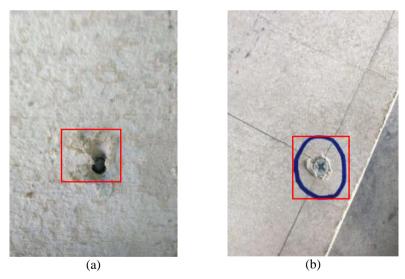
Dry board failure: (a) crushed on dry board; (b) circular crushed on the dry board
